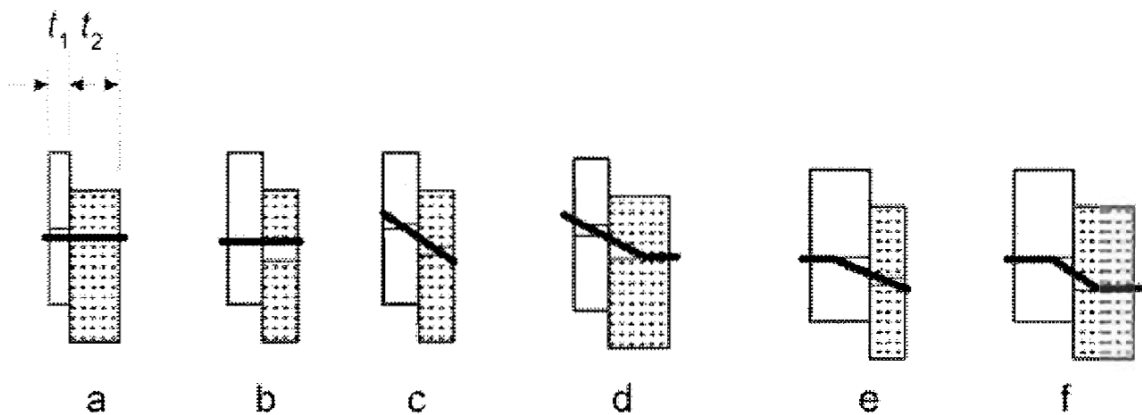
Failure modes fasteners in single shear timber-timber
